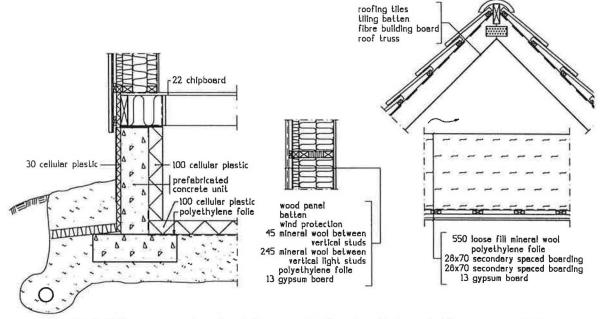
Different constructions: foundation, external walls and roof in house 1. All measurements in the figure are in mm.
